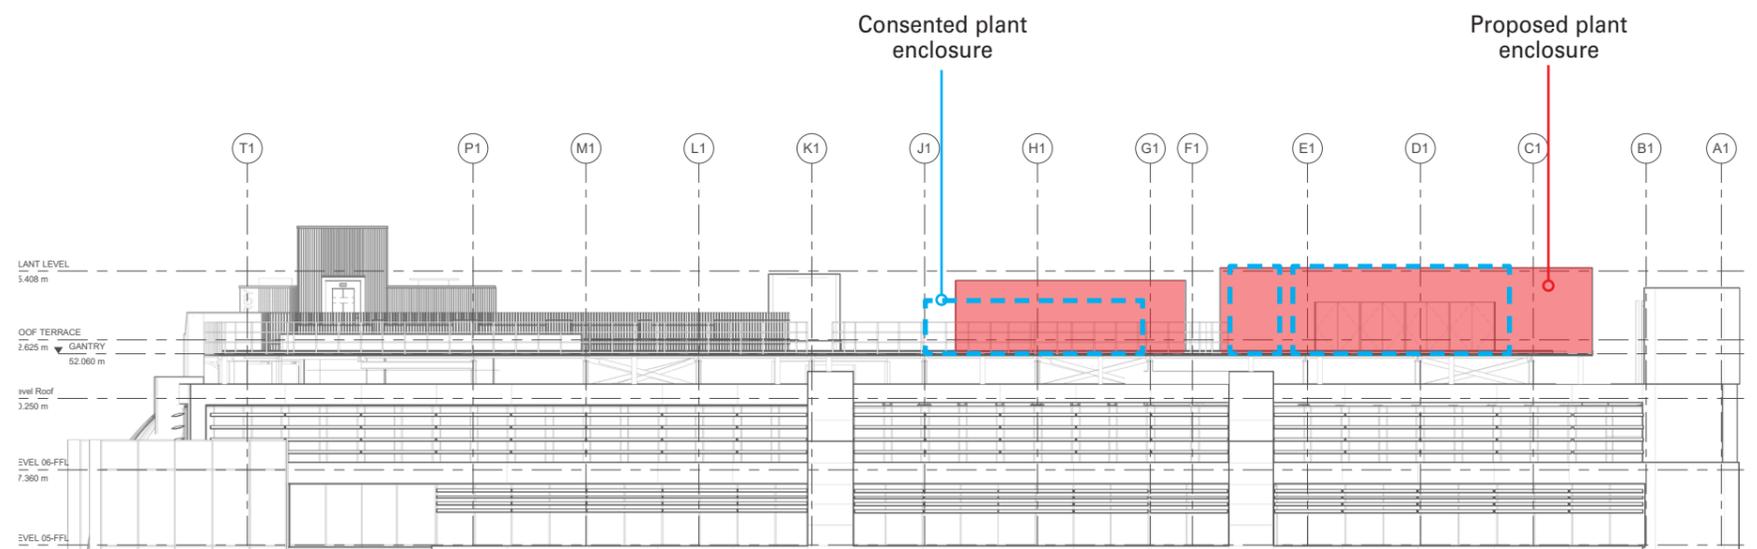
East Elevation - Overlay consented and proposed plant enclosure
